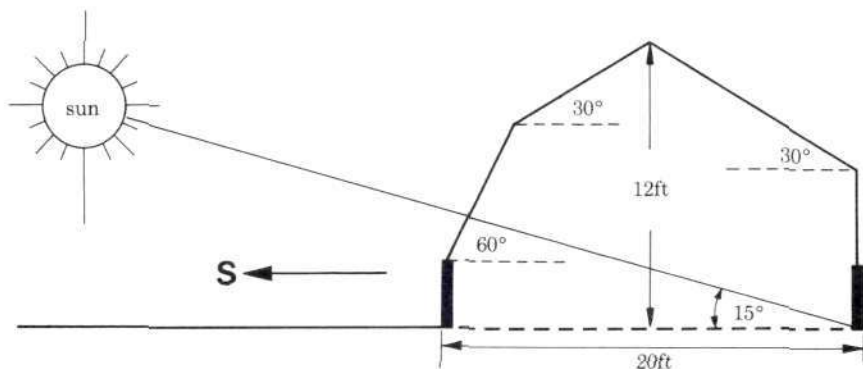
the shadow cast by wooden glazing bars in winter in a house oriented north-south. The lower the elevation of the sun, the greater the shade.
